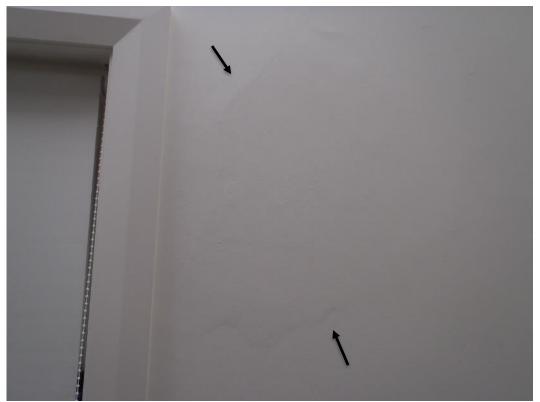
shows evidence of previous repairs to the painted cement rendered wall adjacent to the cupboard in the front Bedroom 1.
